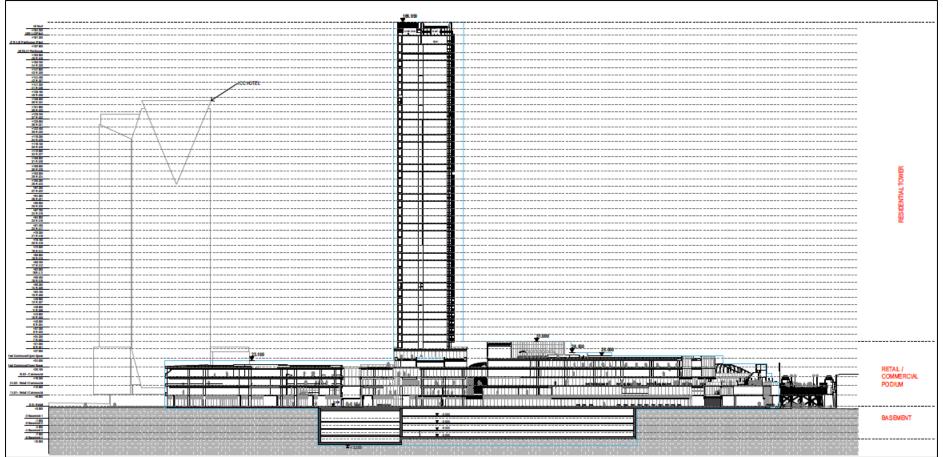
Indicative Plan Only – Section (23.1) (Source: fjmt, 28/09/2020)
